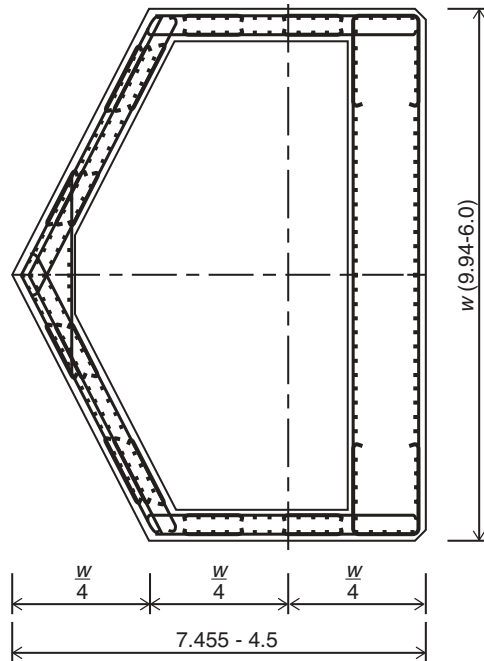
Cross section of the legs in East Bridge pylon above the deck level
